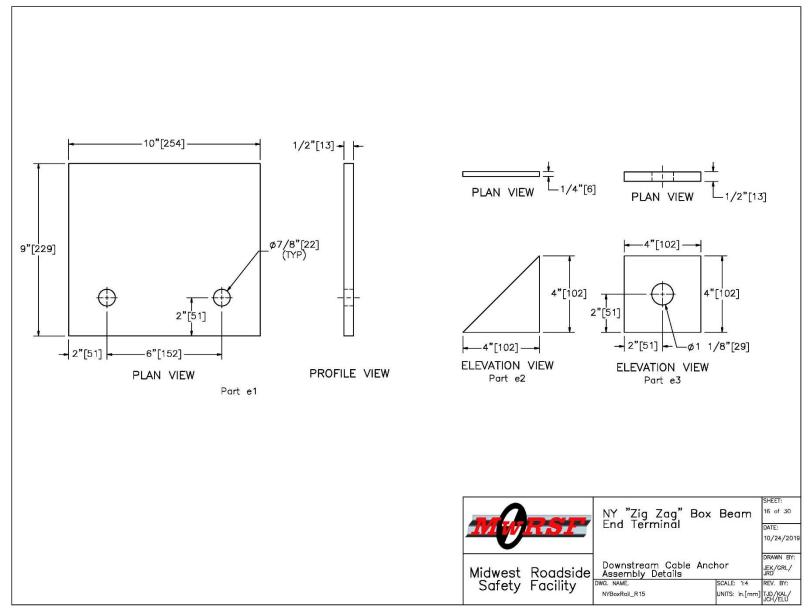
Downstream Cable Anchor Assembly Details, Test No. NYT-1
